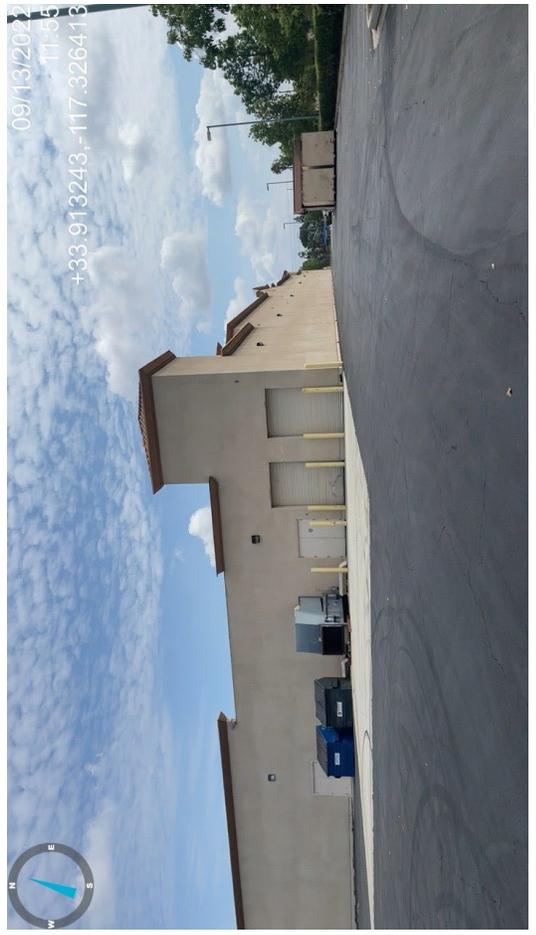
View Northeast of southern side of project site existing structure, also showing active recycling center structure.
